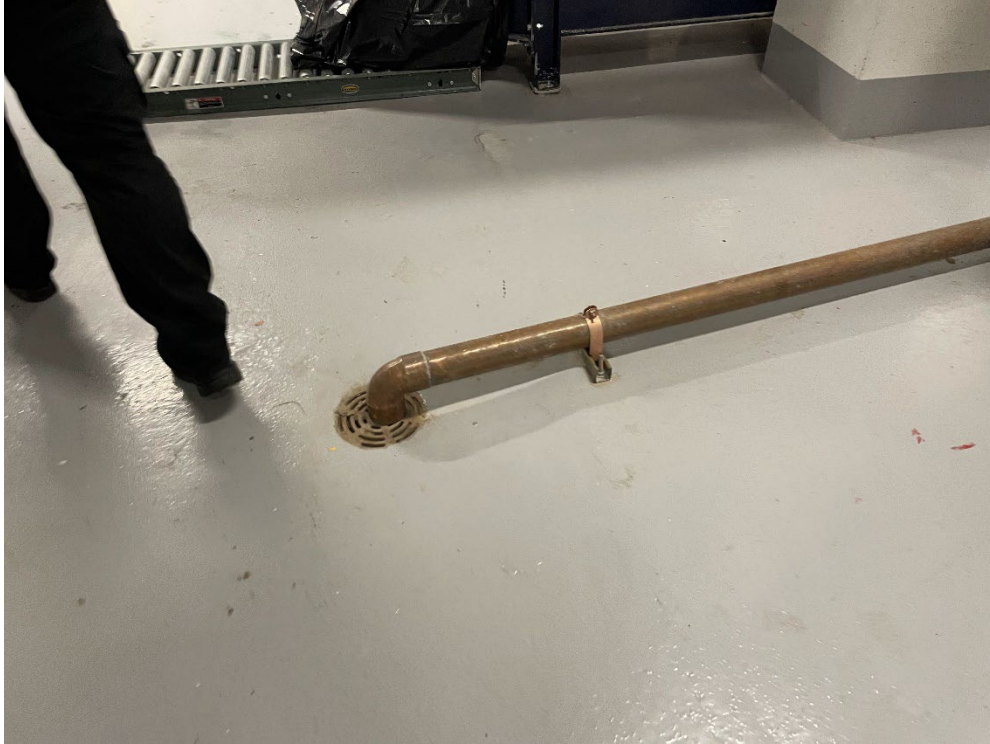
Photo of the concrete slab in a mechanical room in the Site's cellar.
